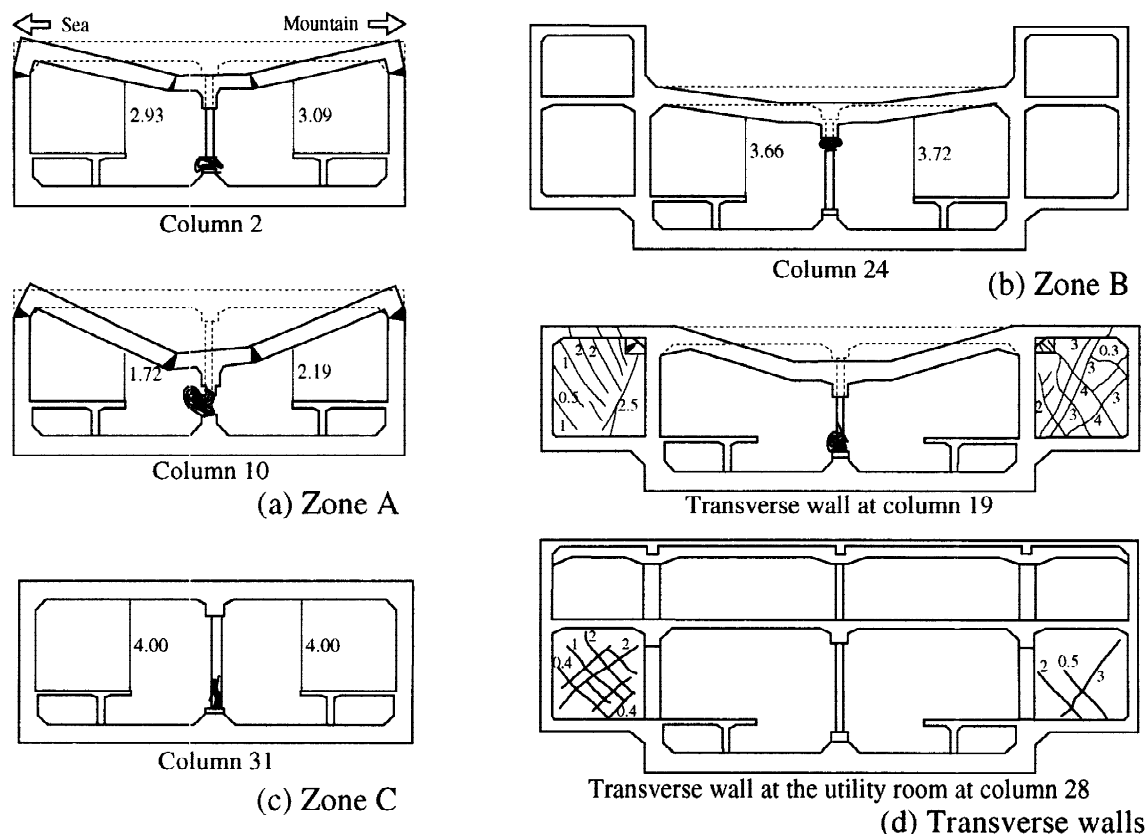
Schematic figure showing the damage pattern in the transverse direction
